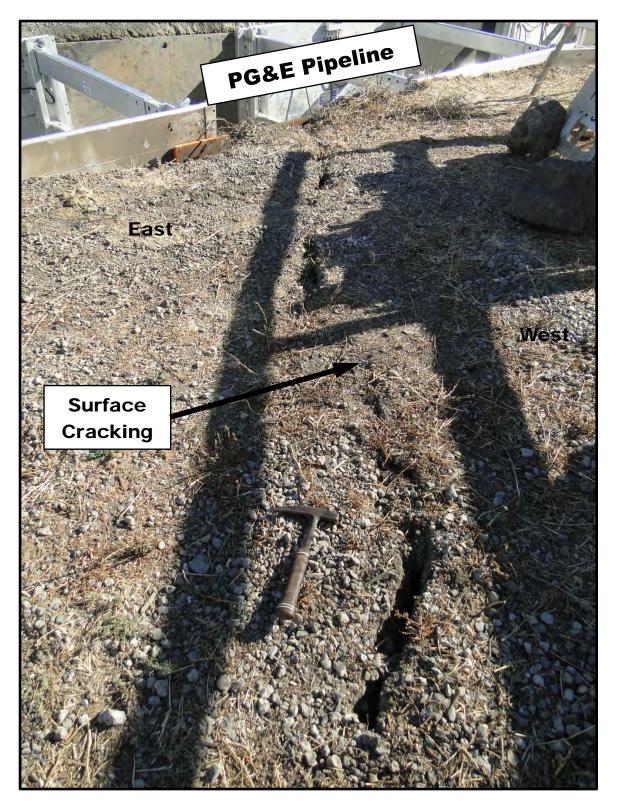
Photograph of linear ground cracking crossing PG&E natural gas pipeline near Los Carneros Road/Stone Bridge School (Point A12)
